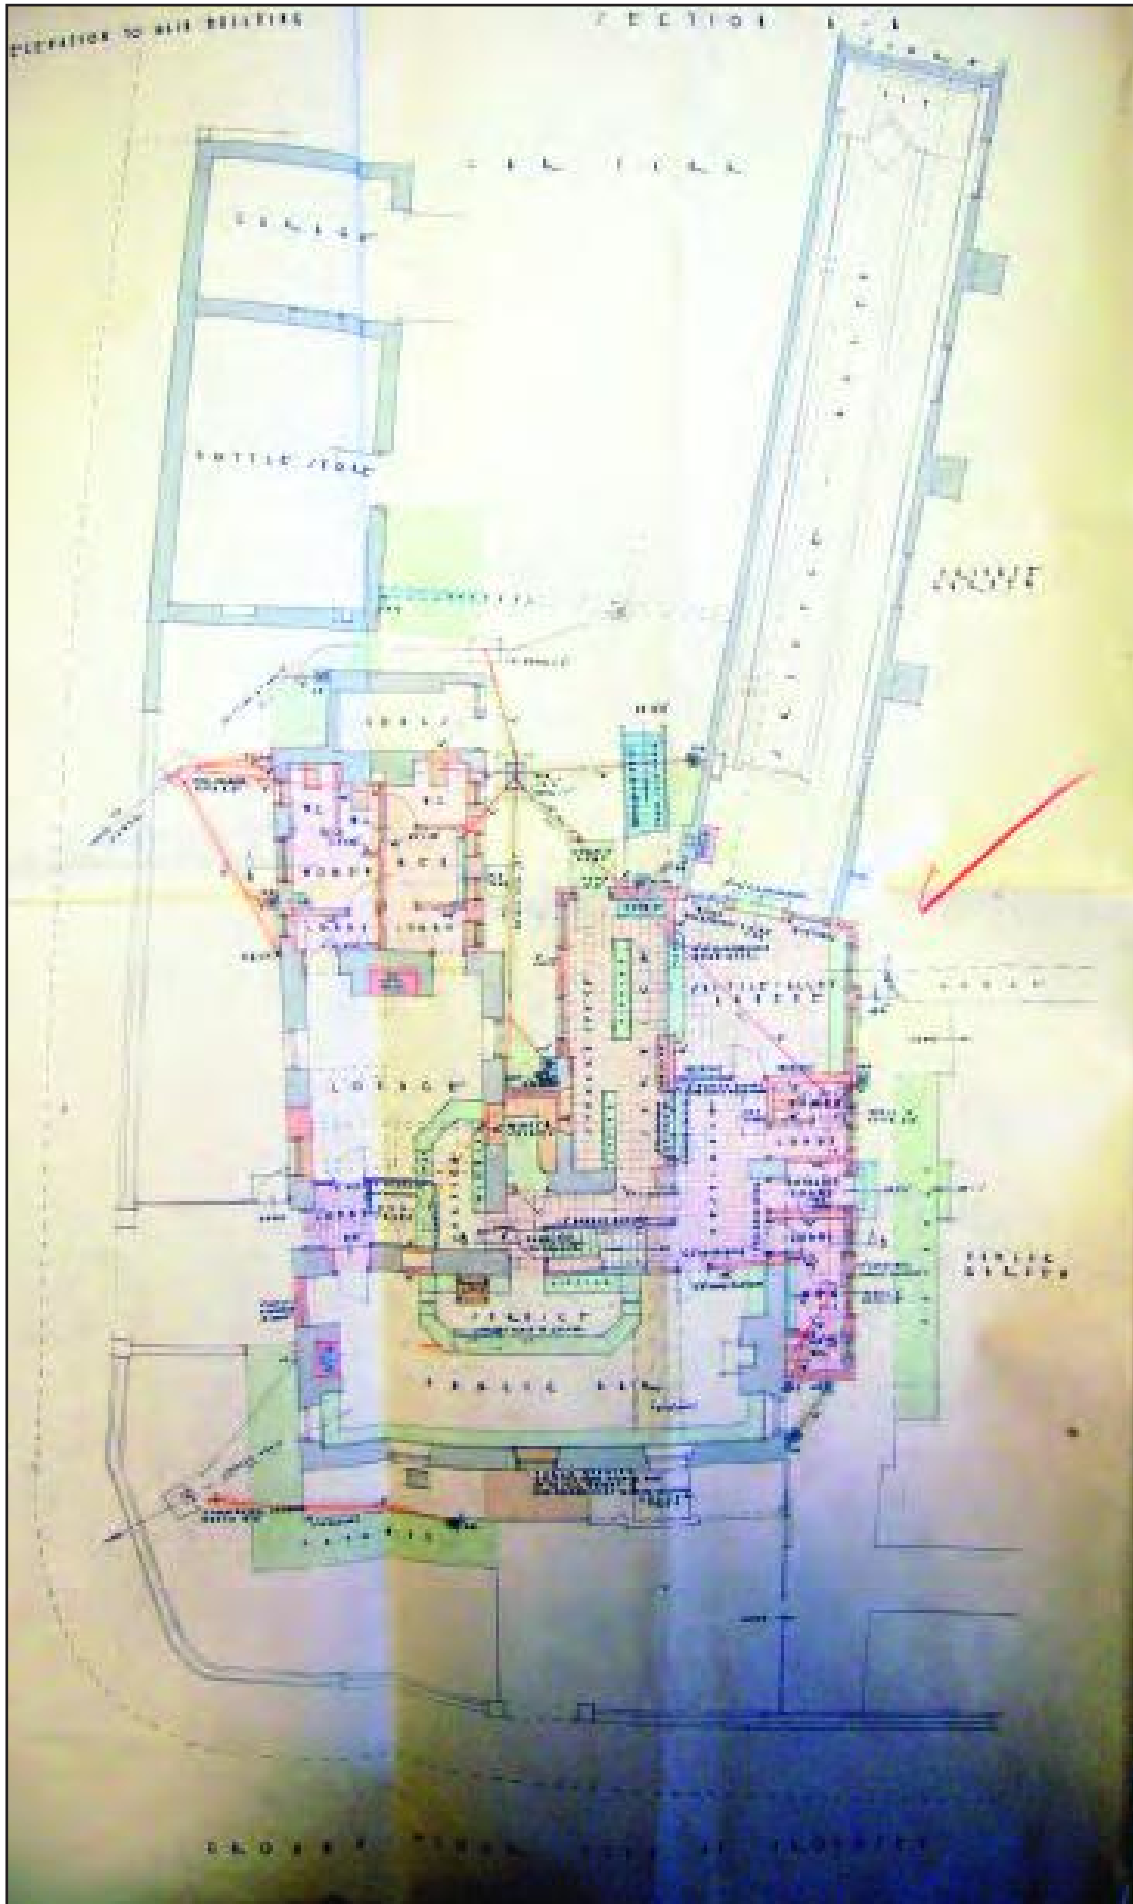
Architect's drawing dated 1955 showing proposed alterations to the ground-floor layout
